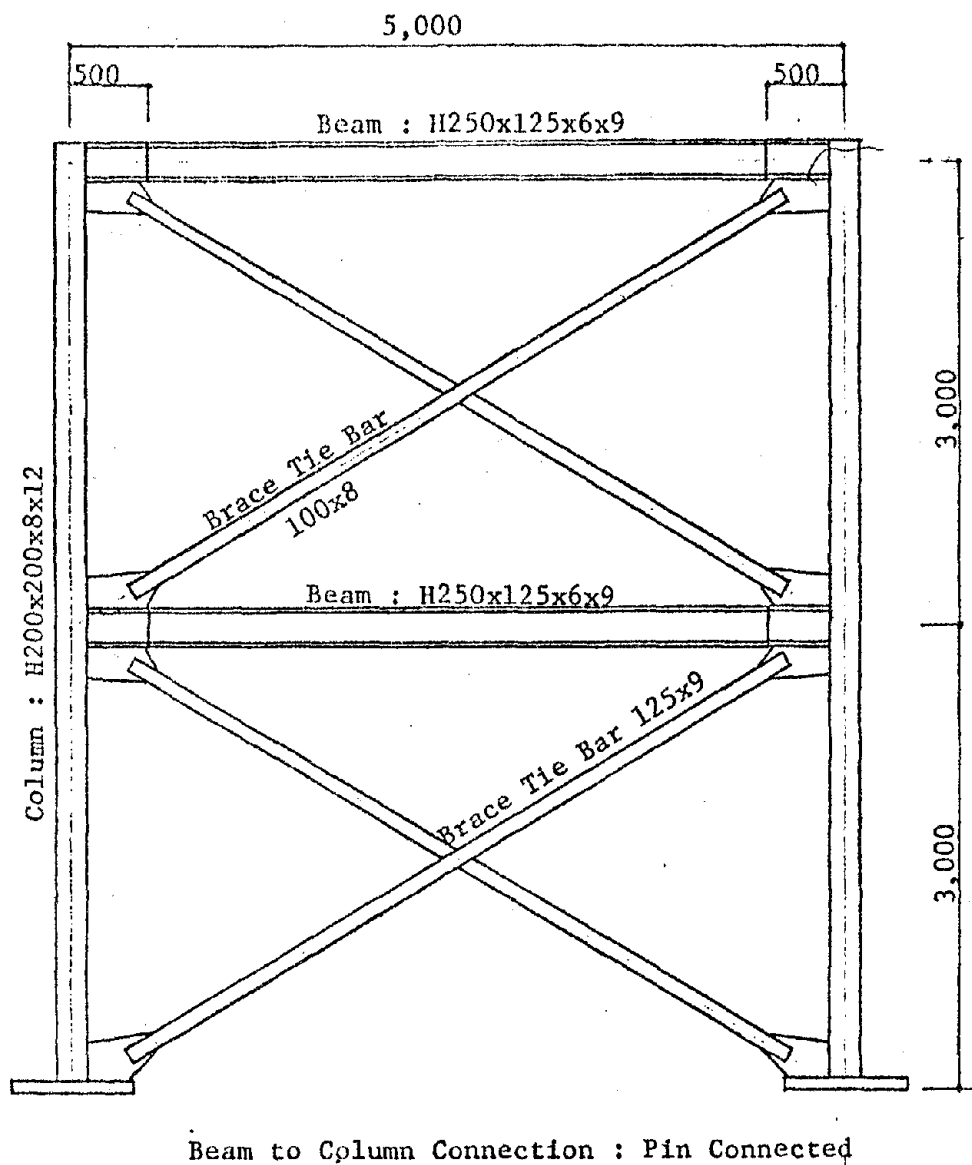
; LARGE SCALE TEST SPECIMEN AND LOADING APPARATUS
